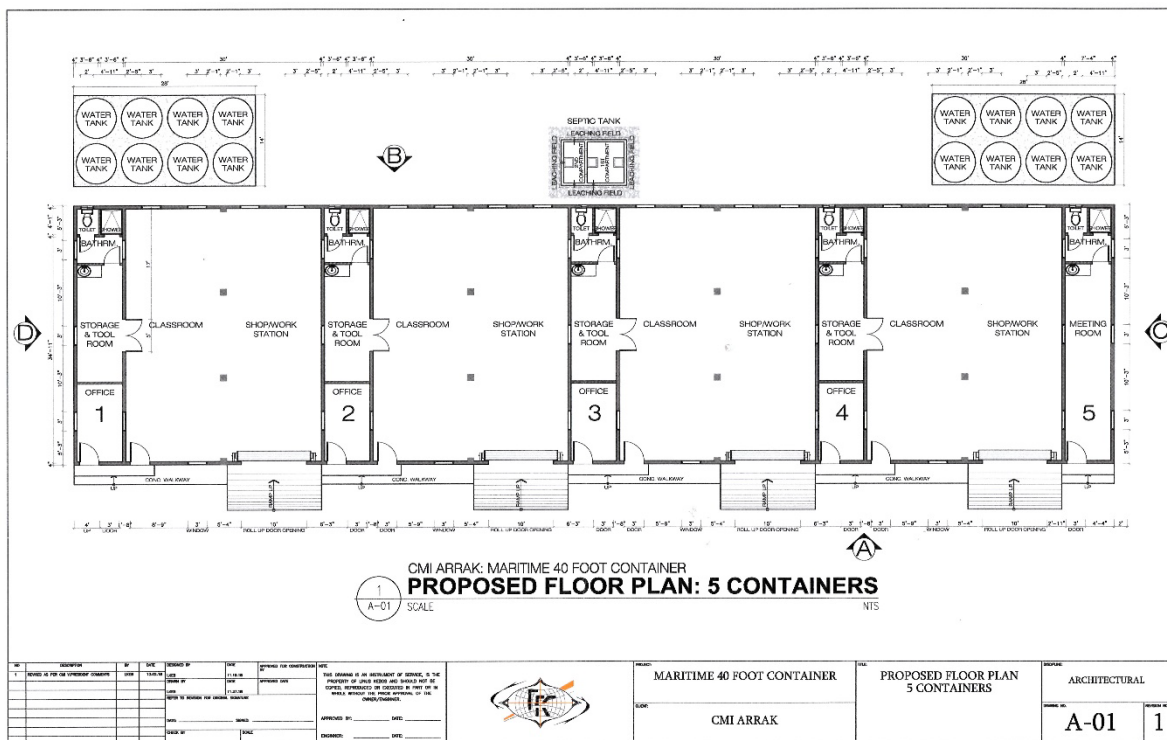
the proposed floor plan for CTE facilities at Arrak campus
